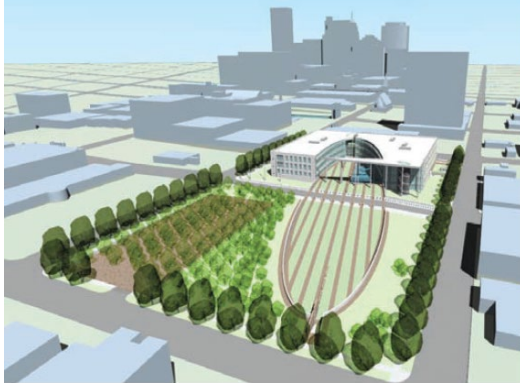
Site plan of the Oklahoma City Federal building with the adjacent park and parking (U.S. General Services Administration, 2004)
